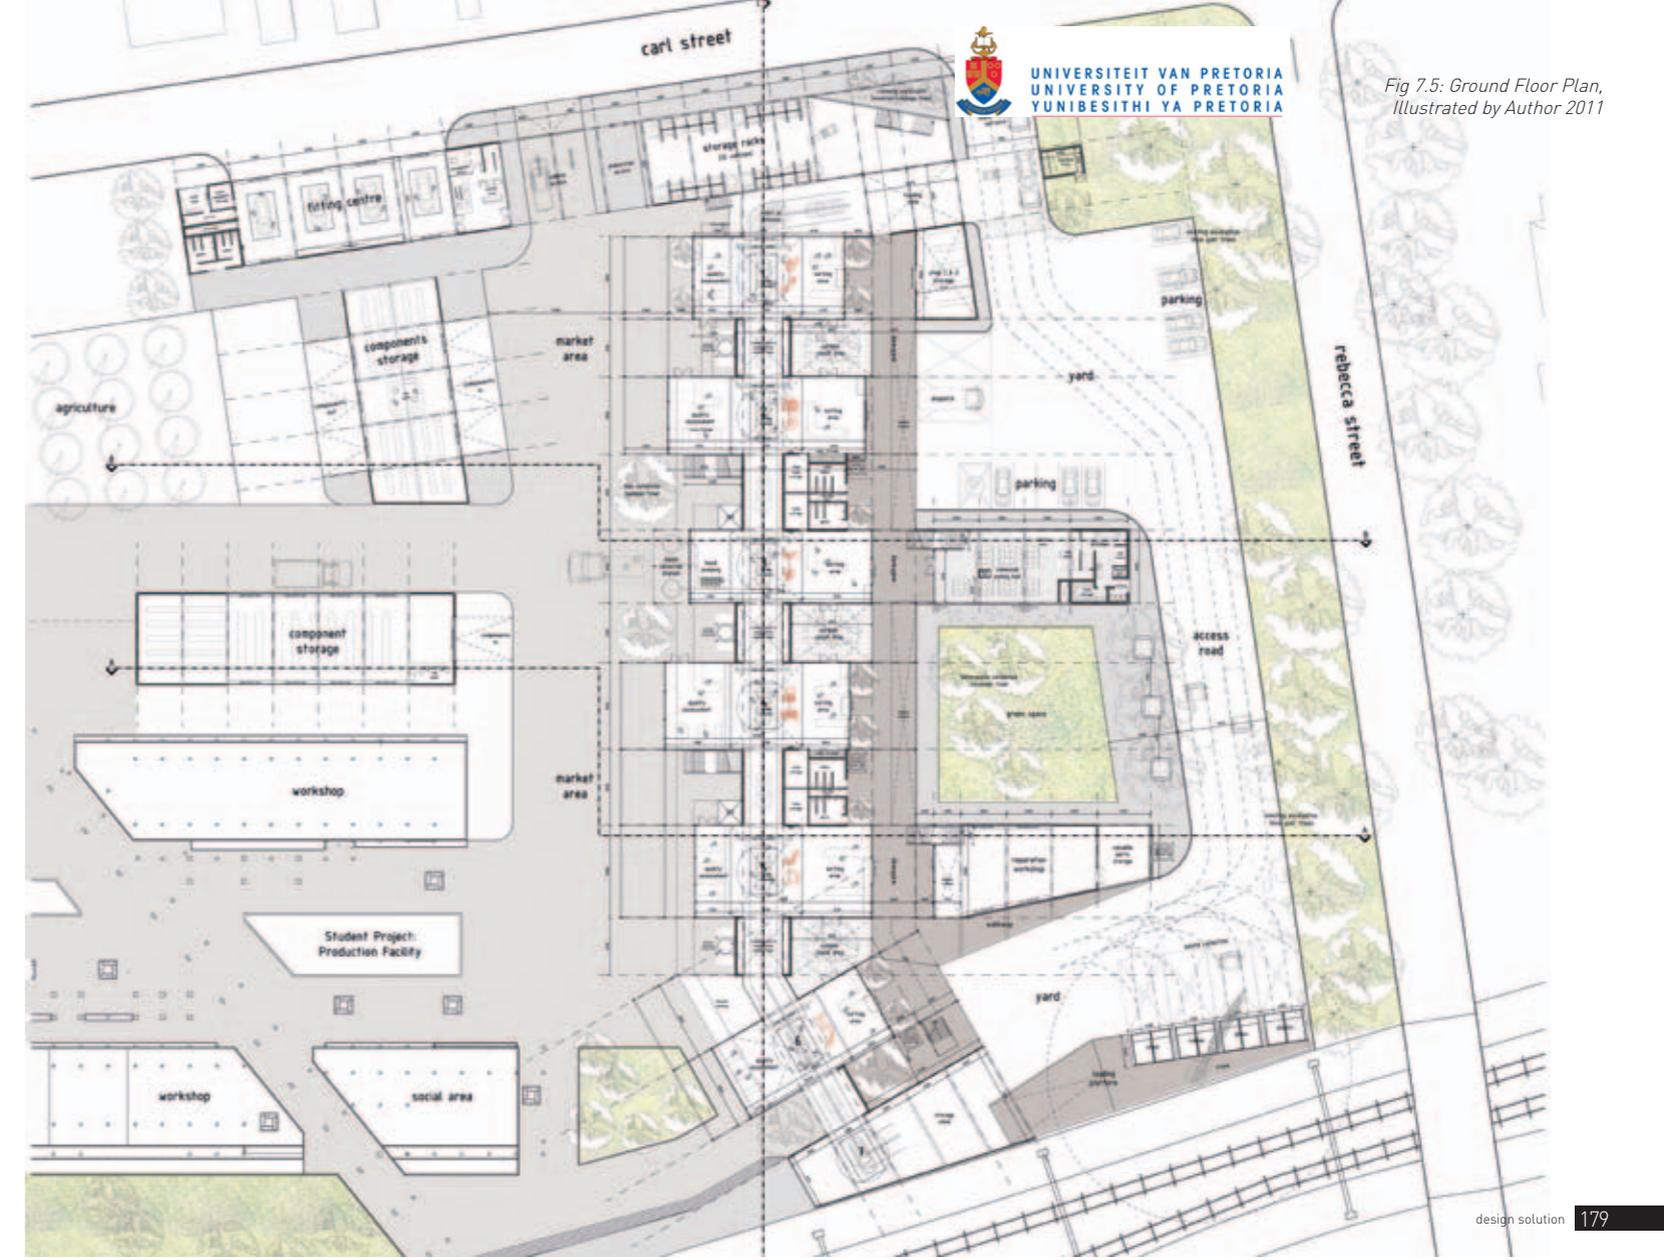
Ground Floor Plan, Illustrated by Author 2011
